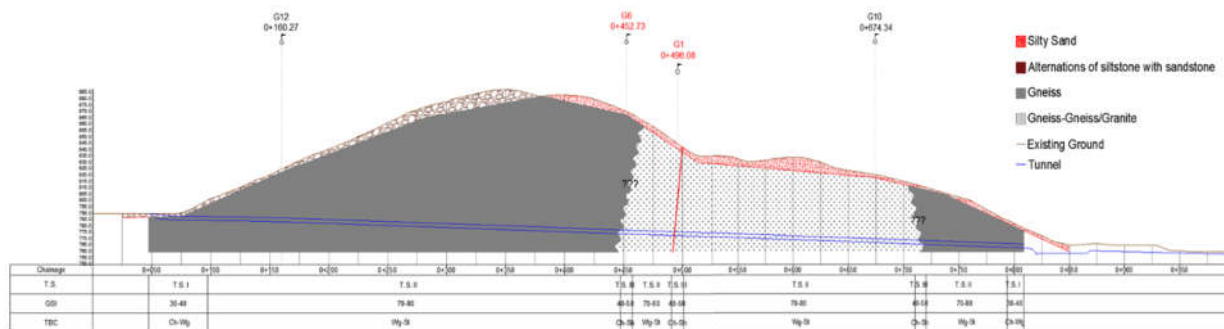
Engineering geological longitudinal section added with tunnel behavior appraisal.
